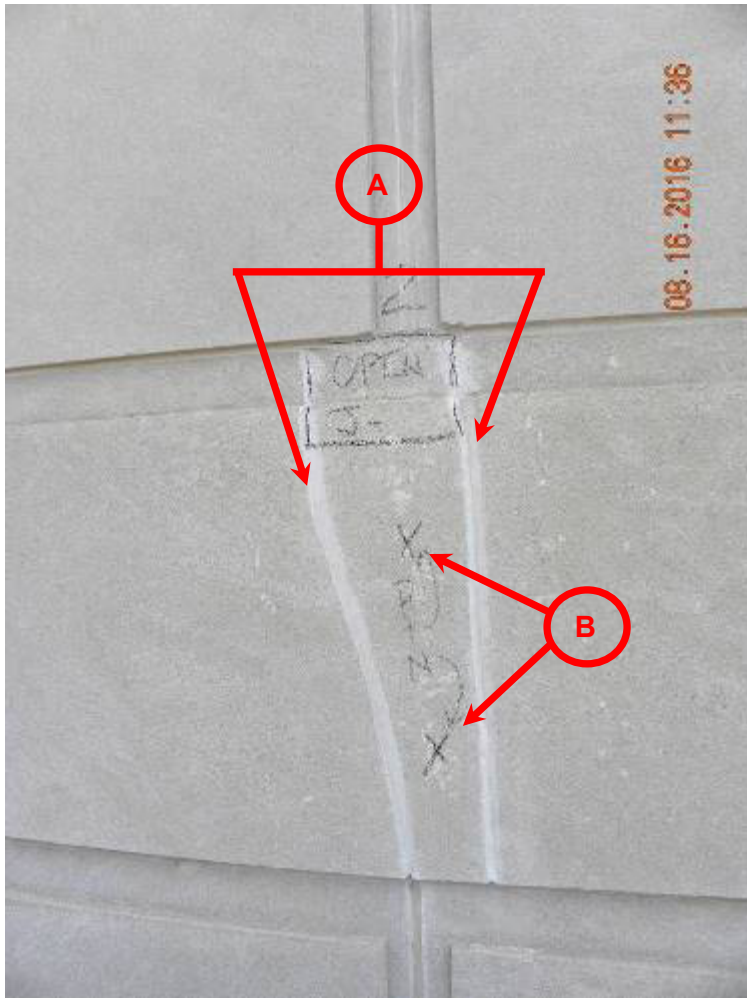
Previously patched cracks, with patch material that does not match the stonework, have started to separate (A). The loose portion of that patched stone was designated to be pinned with stainless steel pins as temporary stabilization (B).
